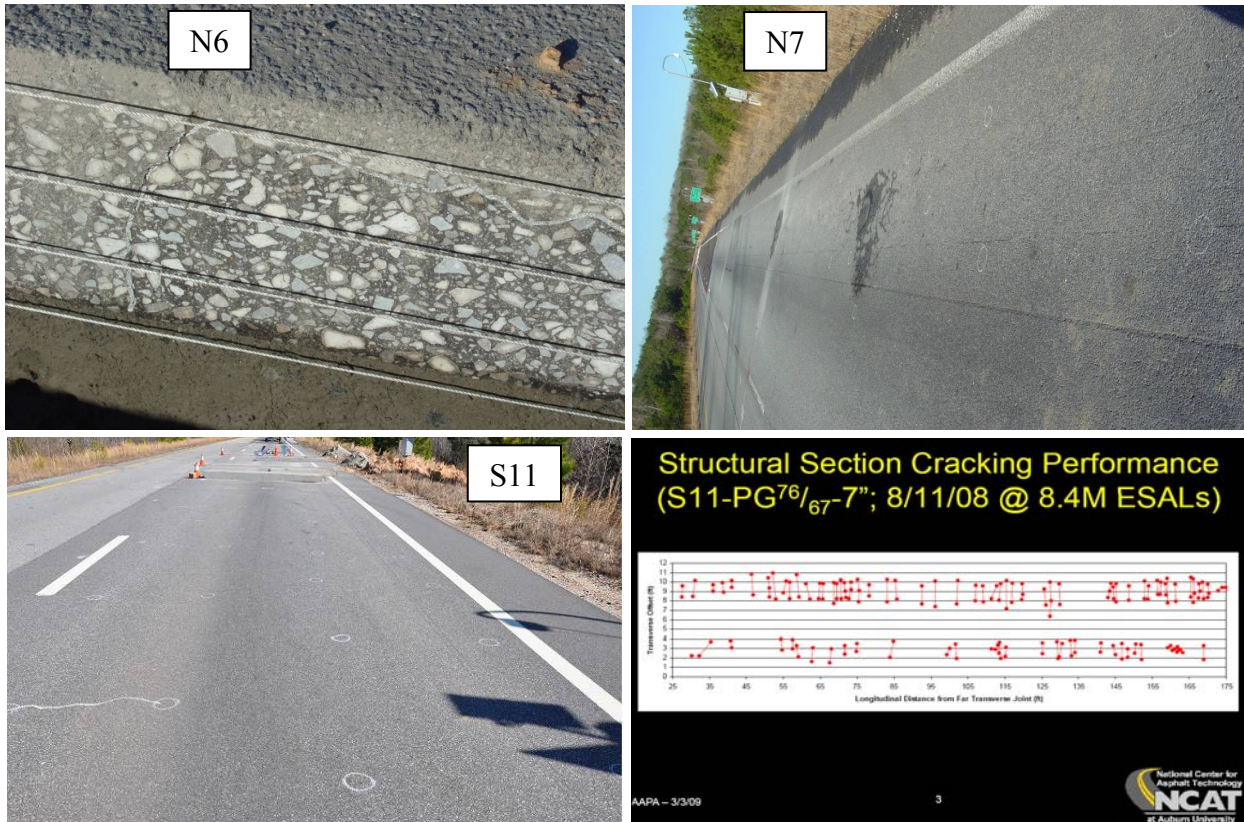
Sections with Fatigue Cracking: N6, N7, and S11.
